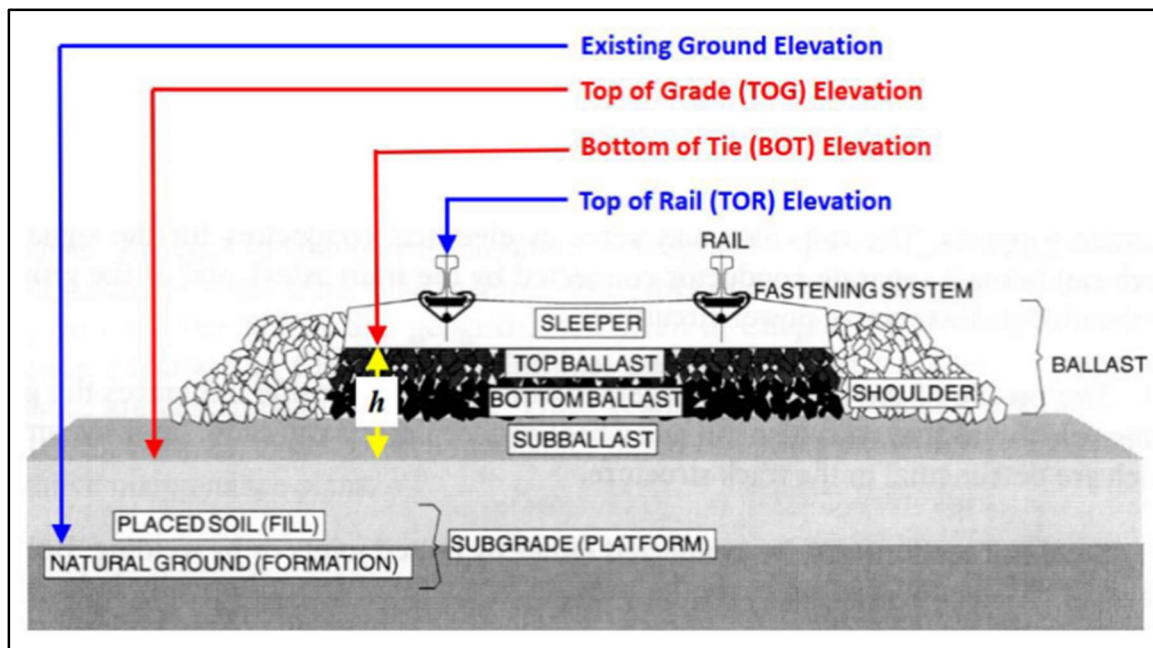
Cross-sectional view of typical rail foundation [6]
